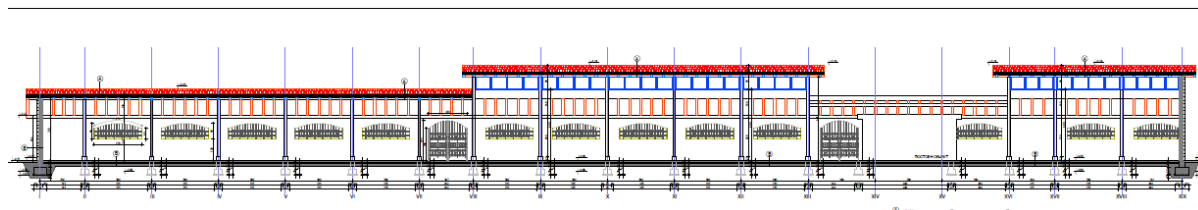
Design of the wall, outside doors and windows towards the street "Gjorgjija Kratovski
